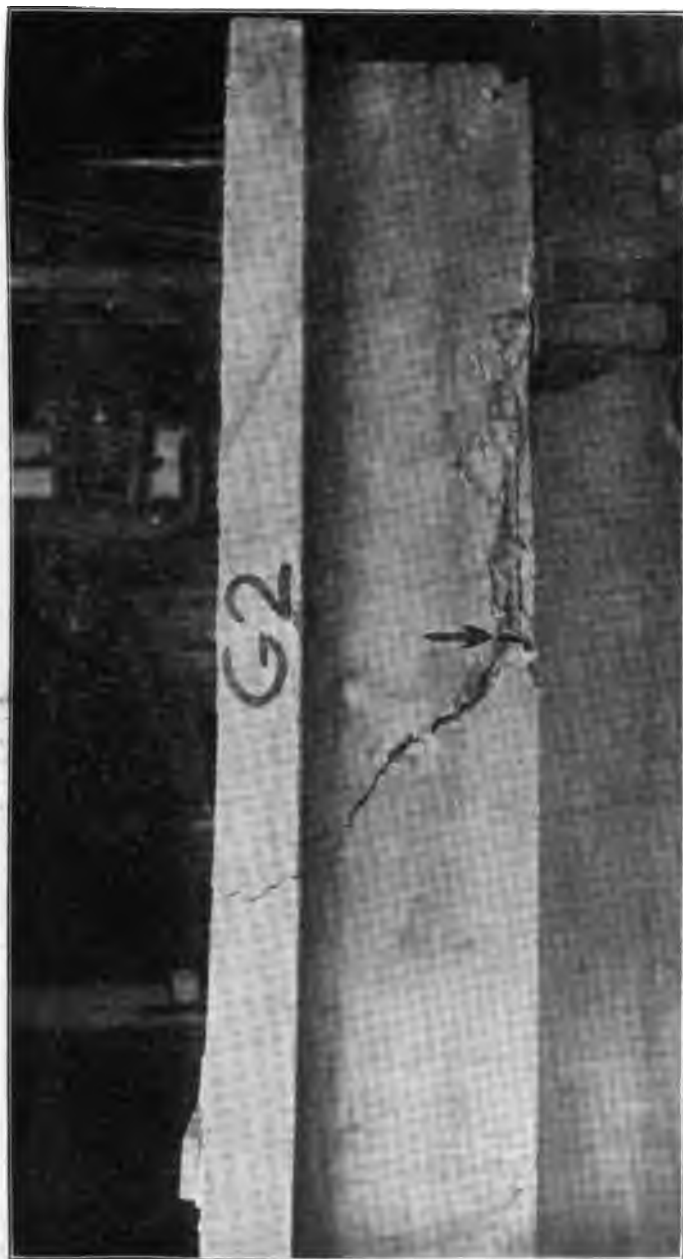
PLATE VII.—FAILURE CRACK IN TEE-BEAM G2.
